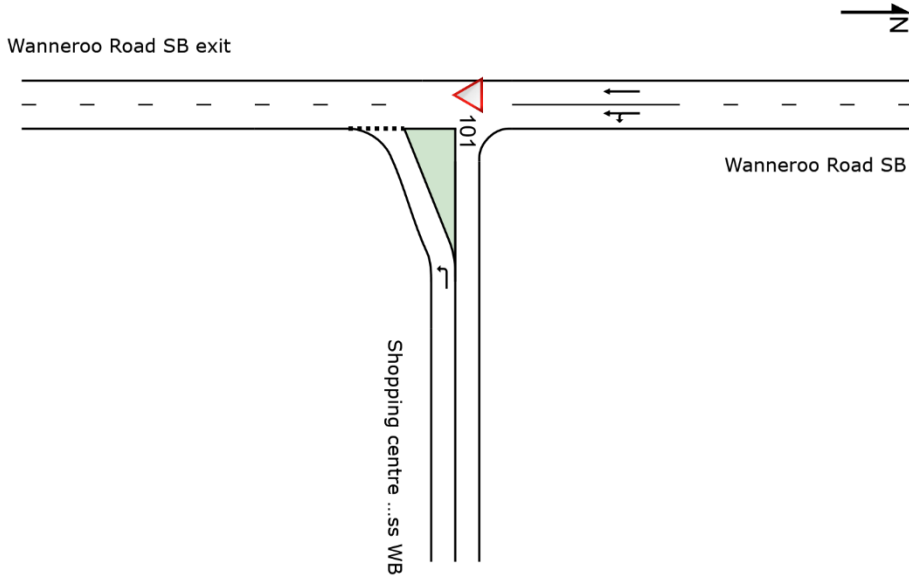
Wanneroo Road / Kingsway south access – layout
